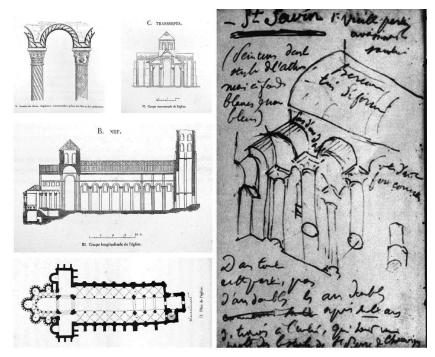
Drawings of the abbey church of Saint-Savin-sur-Gartempe, France. Prosper Merimée and Gérard Séguin, *Notice sur les peintures de l'eglise de Saint-Savin* (Paris: Imprimerie royale, 1845) Choir arcade, detail, fig. 10; Section of transept, fig. 6; Section of nave, fig. 3; Plan, fig. 2 (left). Choisy's sketch of Saint-Savin. Royer "A Propos des Notes de Voyage et Carnets de Croquis d'Auguste Choisy," *Academie des Beaux-arts: Communications*, 1959–1960 (1960) 53–60 (right).
